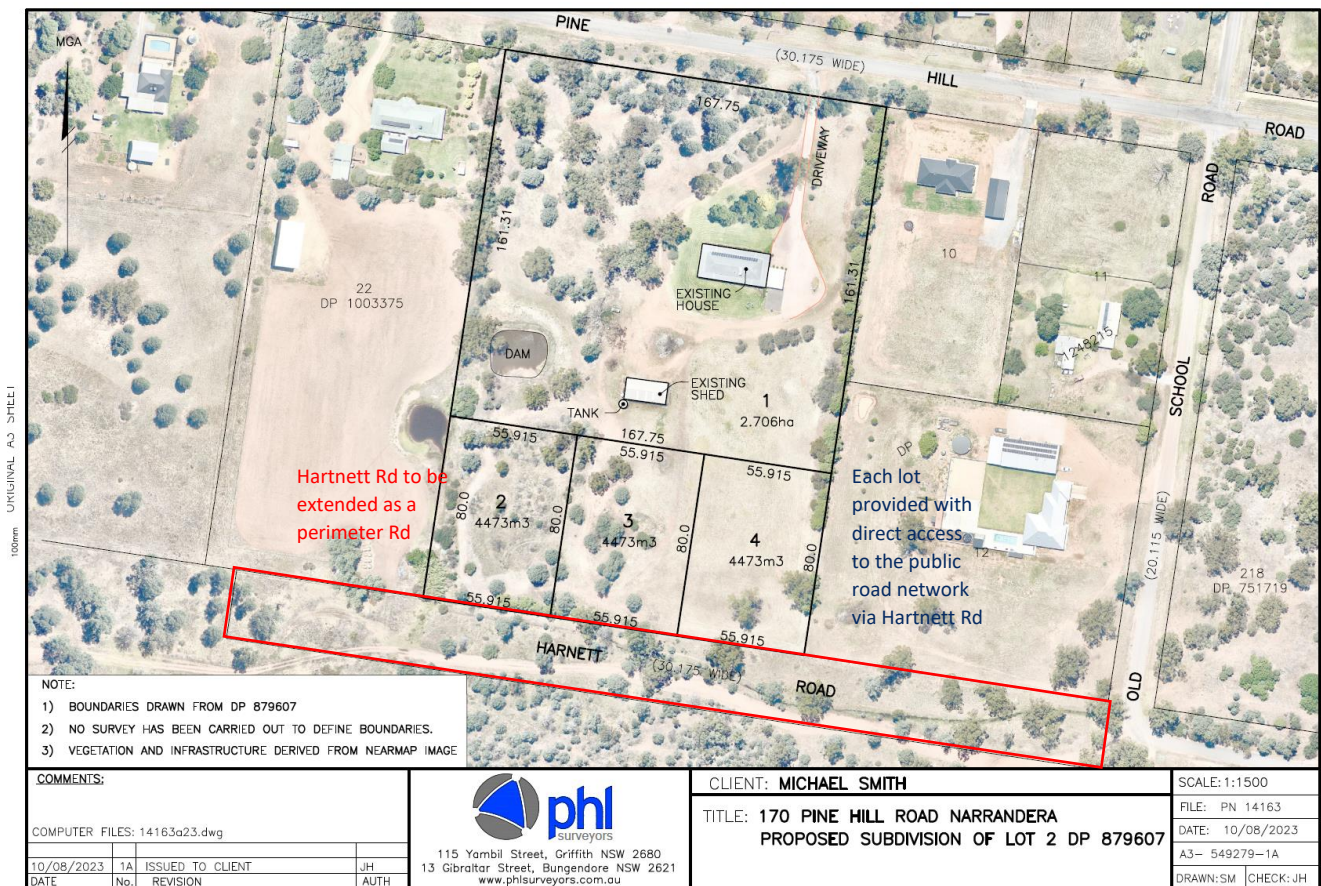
Layout of the new subdivision demonstrating access provision via extension of Hartnett Rd to provide access to the new lots.
